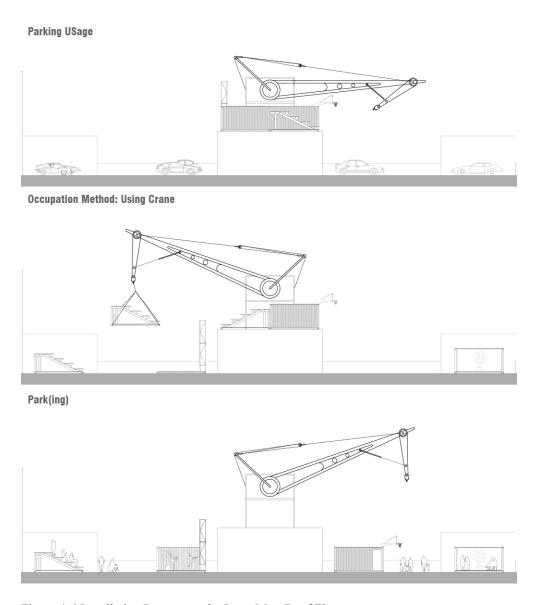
Installation Process on the Lotte Mart Roof Floor
